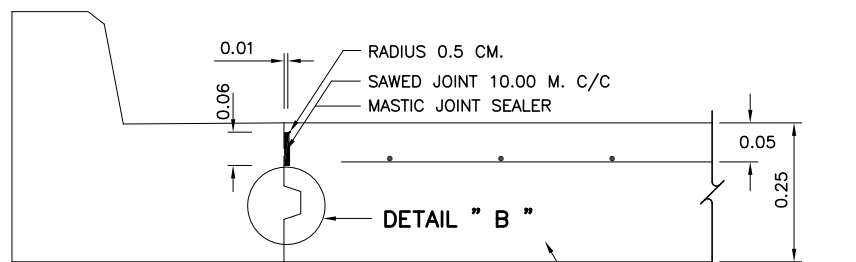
DETAIL OF BROOM SURFACE CONCRETE PAVEMENT
